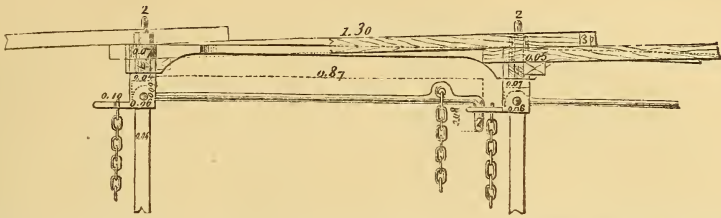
Elevation of the details for uniting adjacent fermettes, seen from below.
